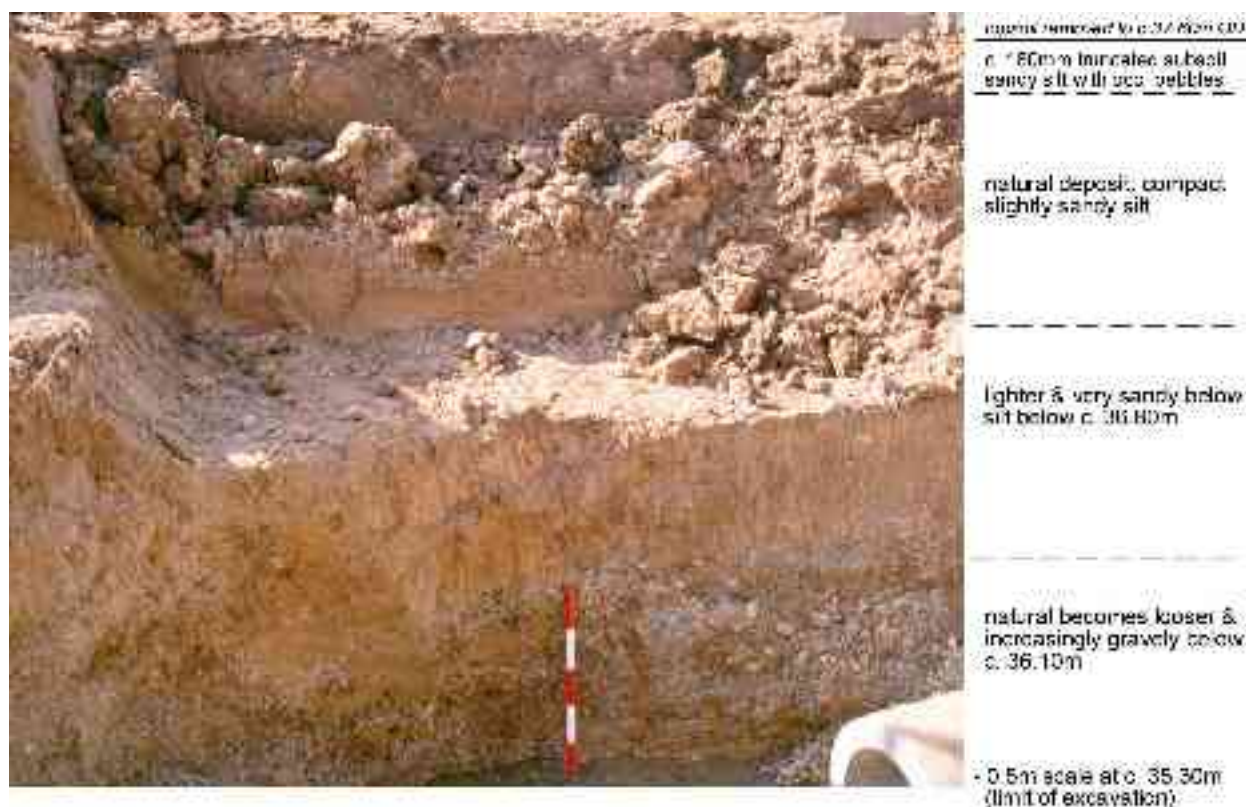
View of the pipe trench excavation close to point F3, looking northwest
